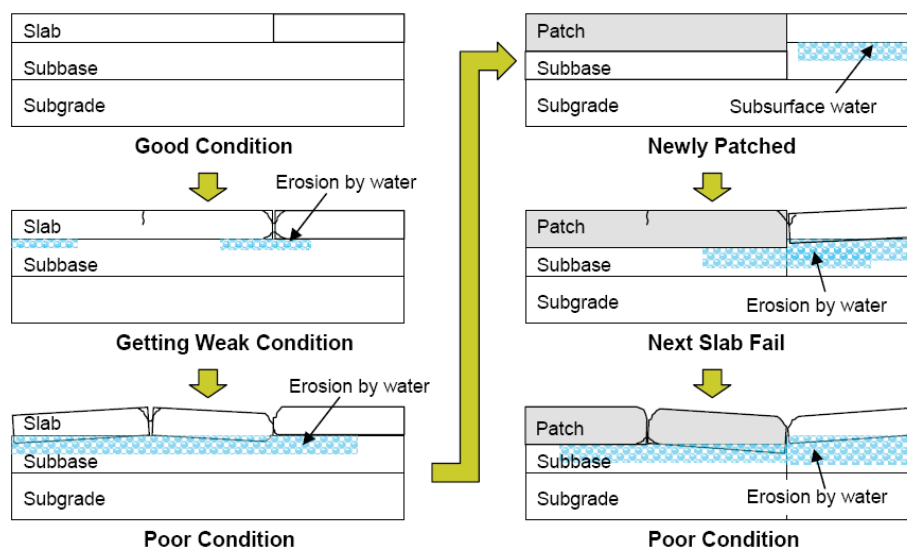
Subbase erosion and pavement deterioration processes (Jung et al. 2009).
